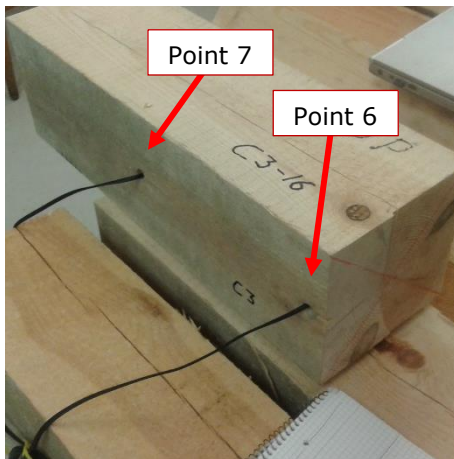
Sensor Point 6 and 7: Measurement points close to the wooden beam end and 286 mm from the beam end.
